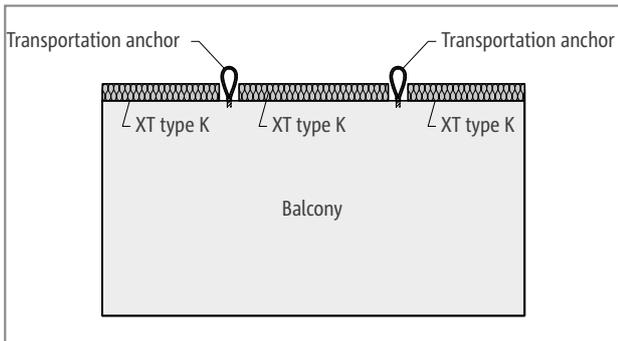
Schöck Isokorb® XT type K: Precast balcony with transport anchor; insulating adapter XT type Z can be inserted on-site
